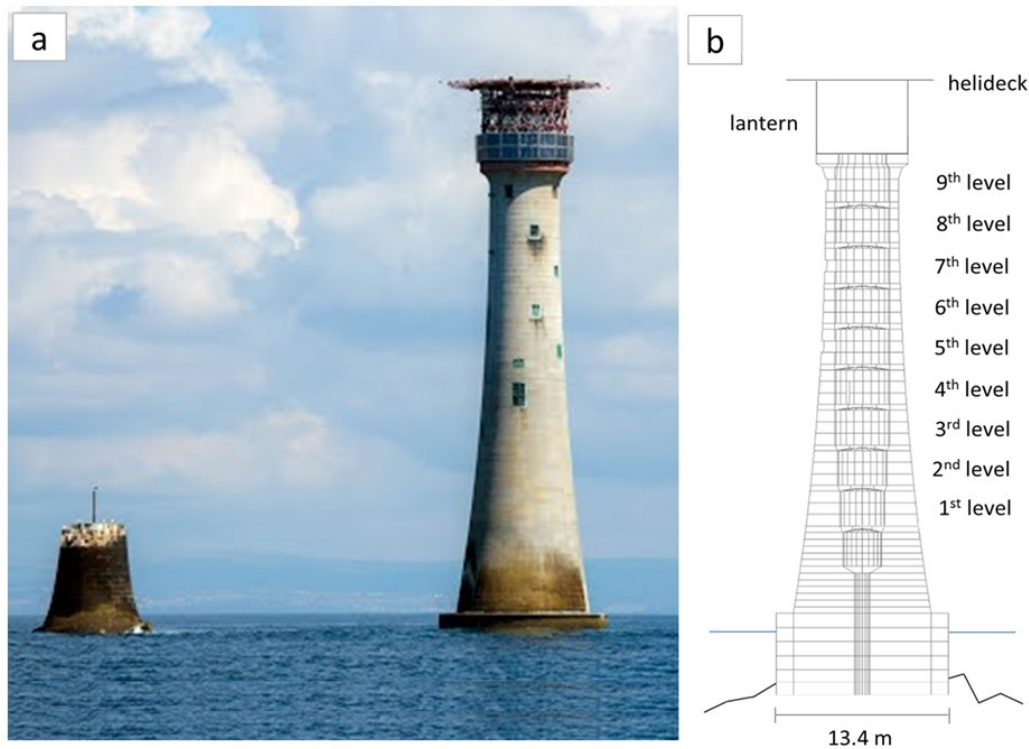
The Douglass tower: (a) photo (Mapio.net, n.d.); (b) sketch of the central section.
